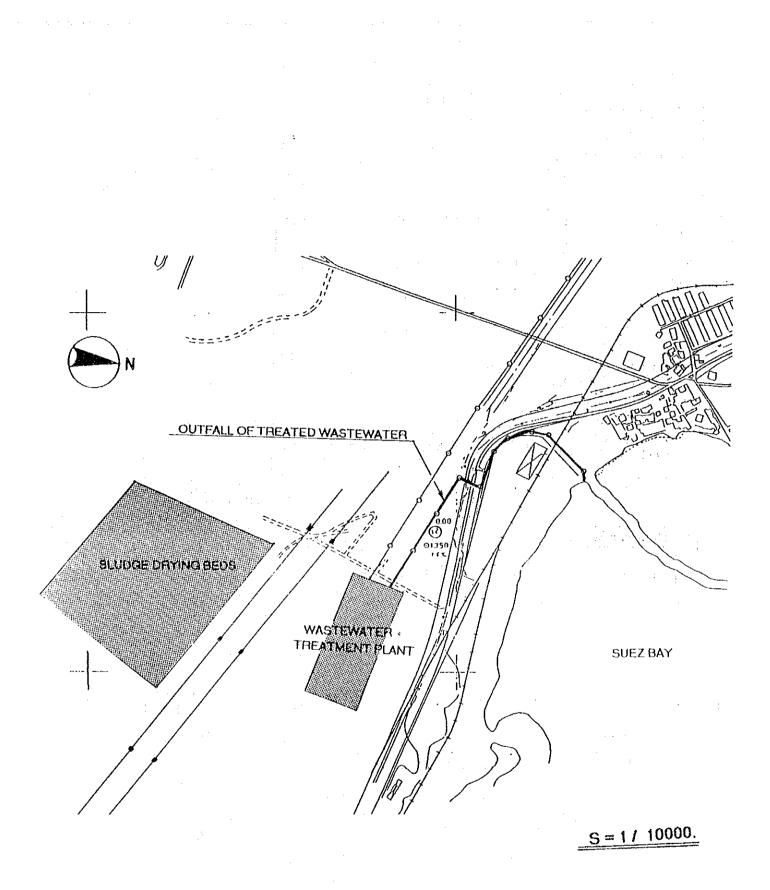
Location of the Outfall of Treated Wastewater from Wastewater Treatment Plant
